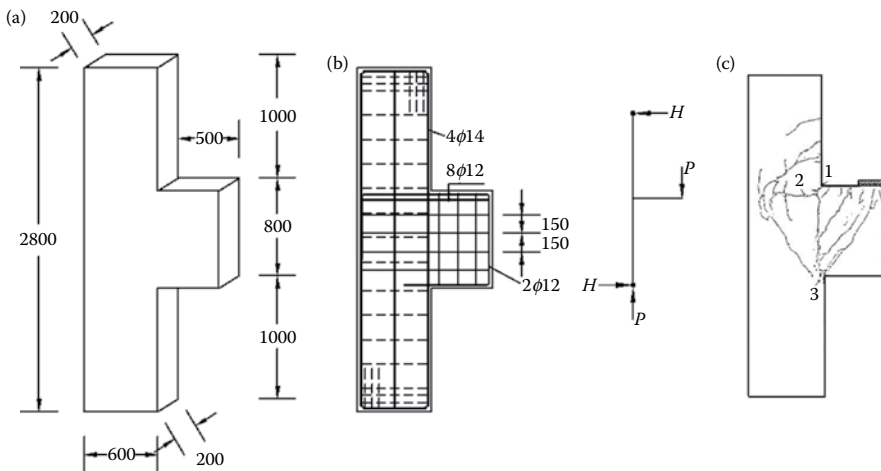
Niederhoff experiment: (a) dimensions (mm), (b) reinforcement, and (c) crack pattern at failure.
